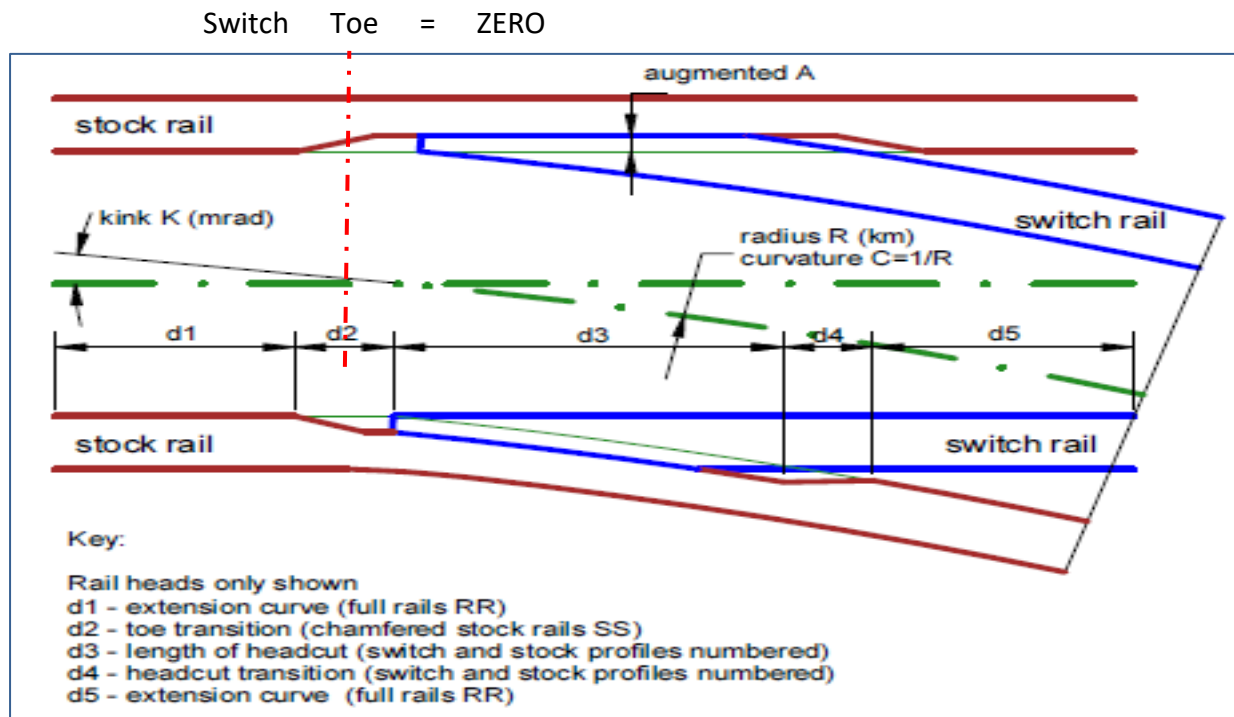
NR60C MK2 Showing Rail Types and Datum Point (Network Rail Track, 2016)
